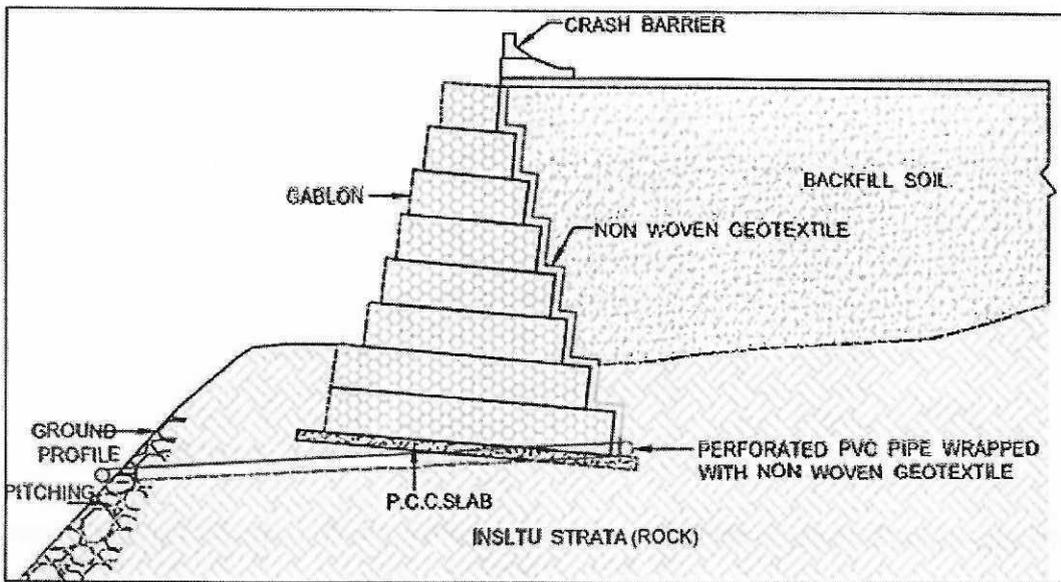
Indicative Cross-section of Gabion Retaining Wall
